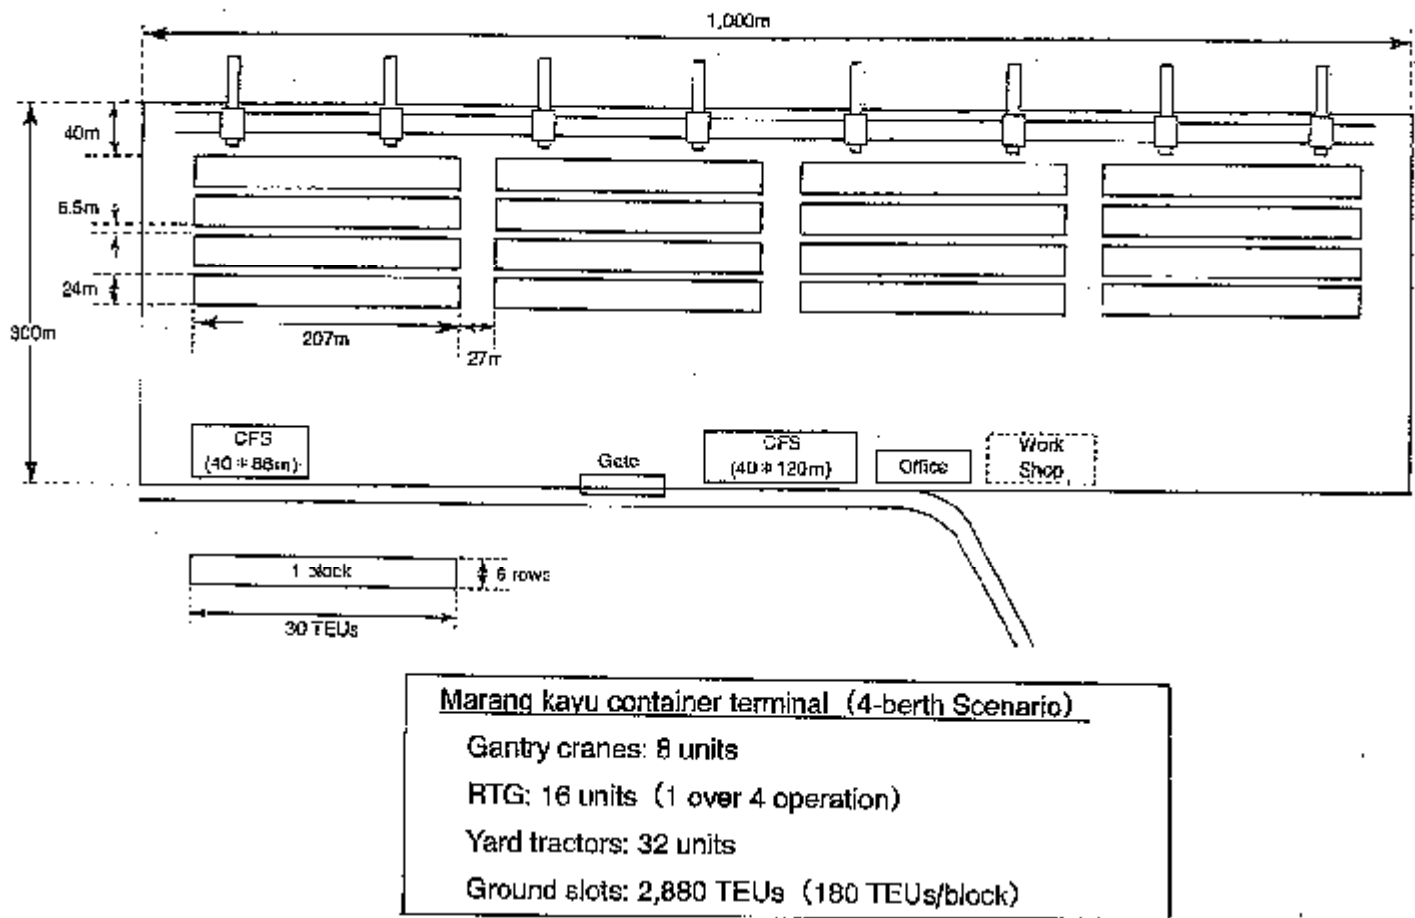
Layout Plan of Marang Kayu Container Terminal in 2025
